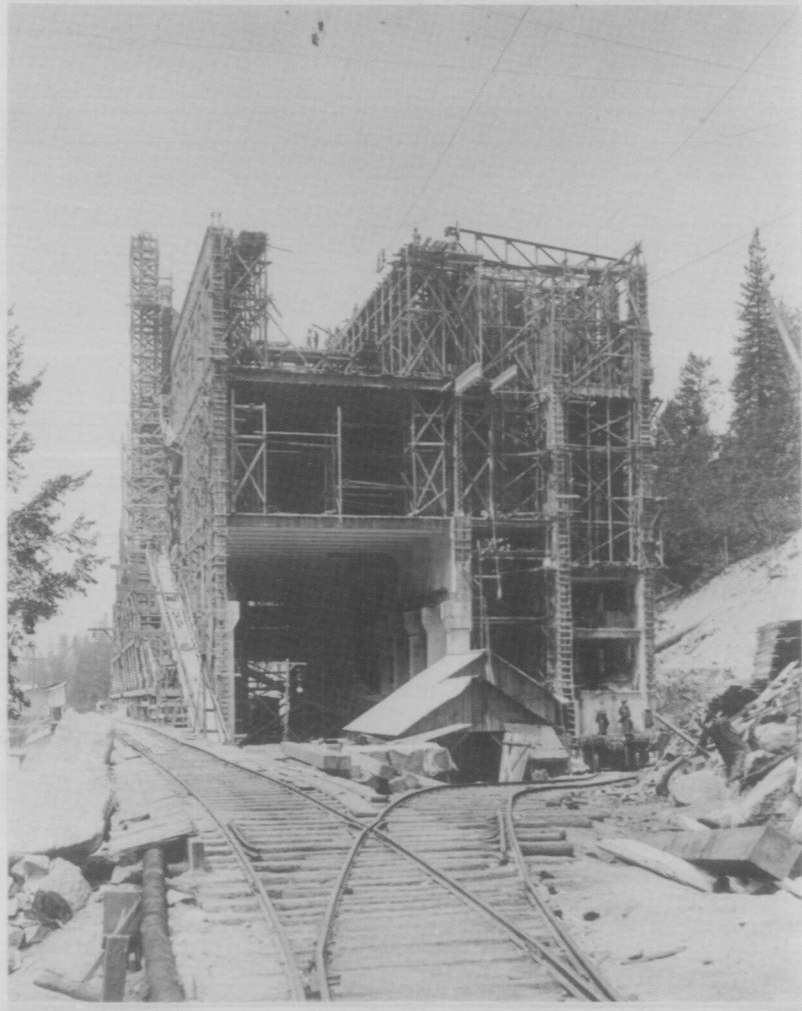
Construction at Powerhouse No. 1, July 1913 (SCE var.
